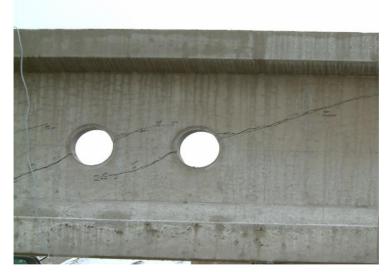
Wide shear induced cracks near the blockouts, which in the state of failure, extend through the entire web
